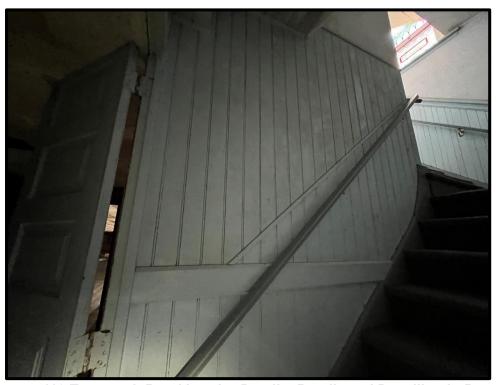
7119 Tecumseh Road Interior Detail – Beadboard Panelling in Basement Stairwell
